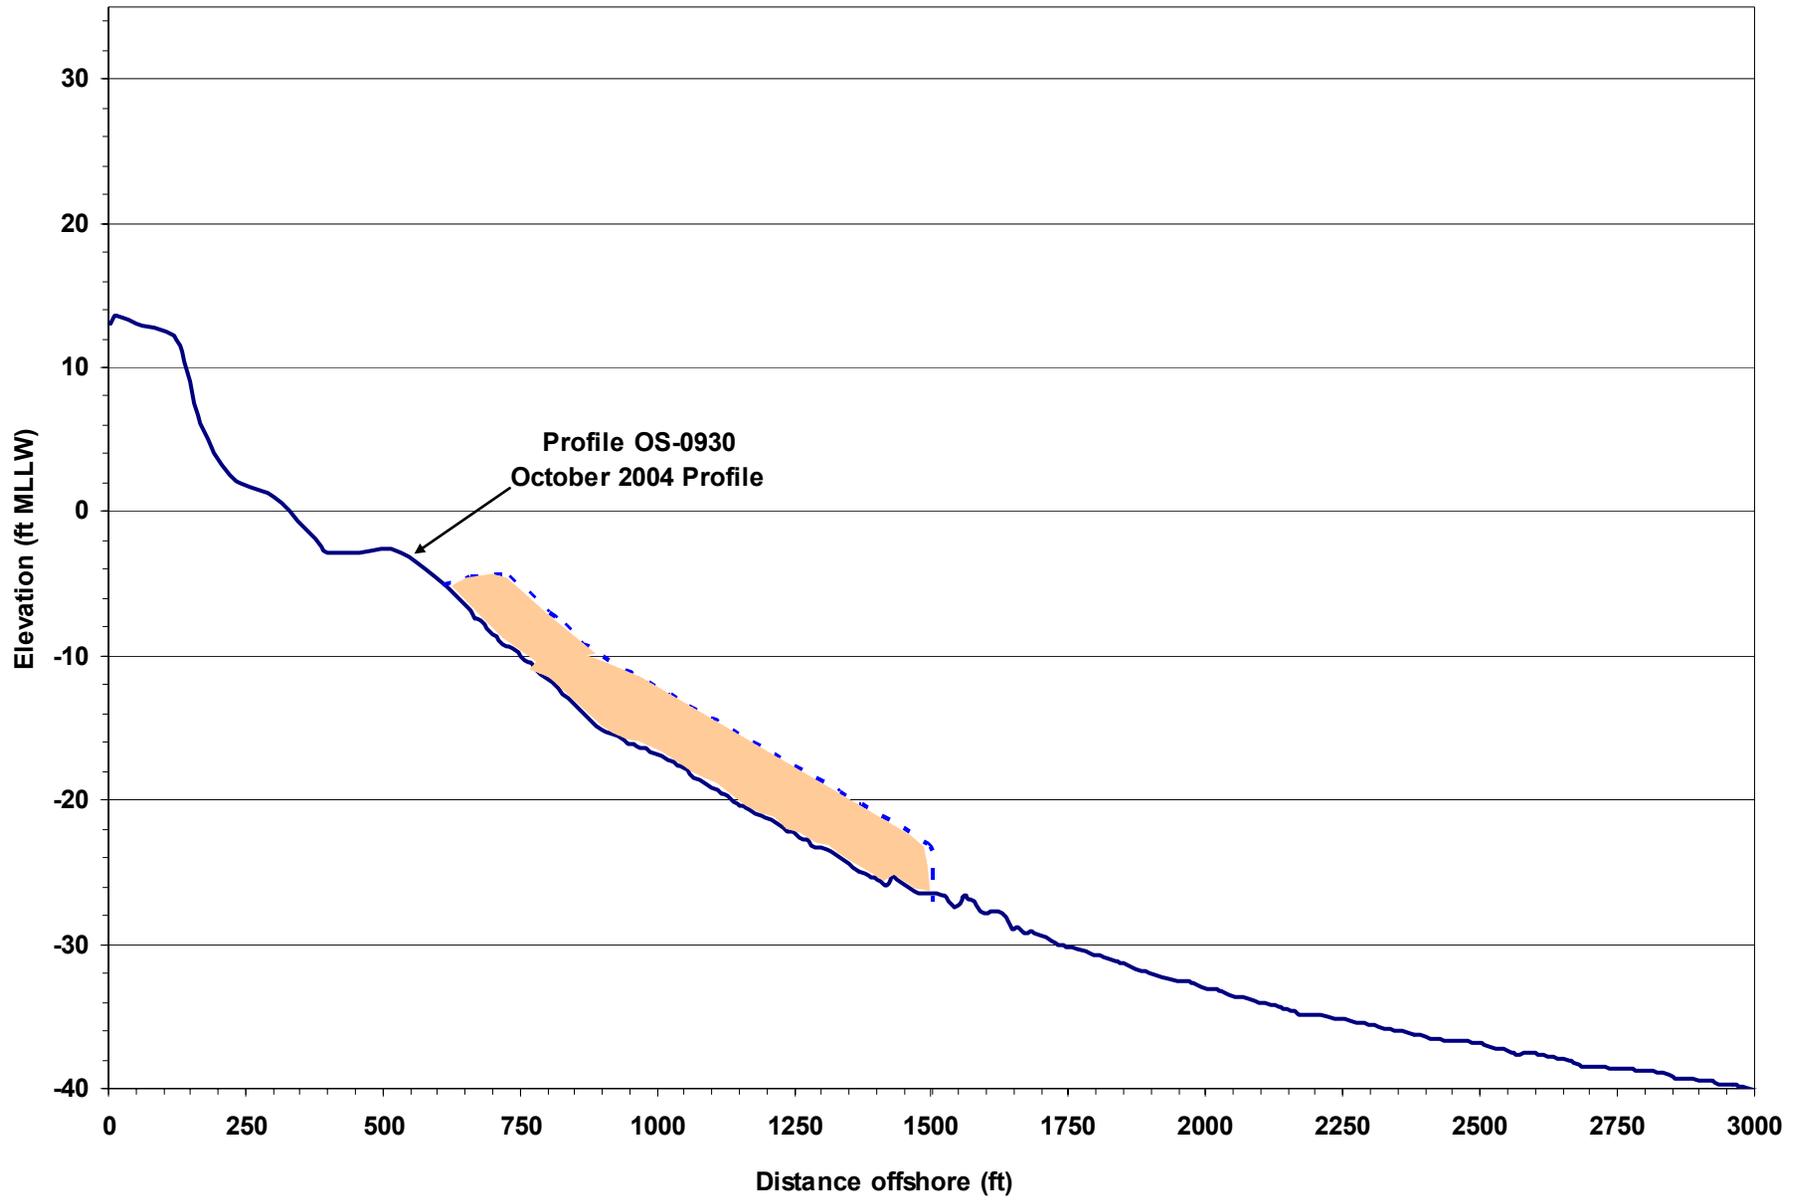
Cross-Section of the Nearshore Placement at the South Oceanside Site
